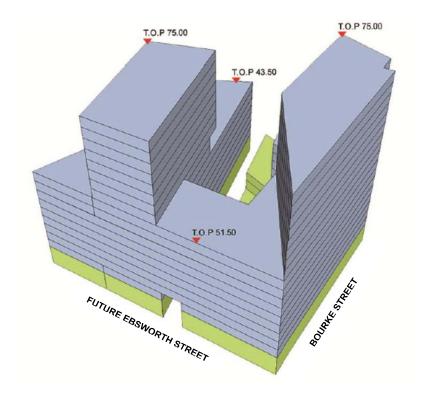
Proposed Building Envelopes – Corner Bourke Street and future Ebsworth Street
